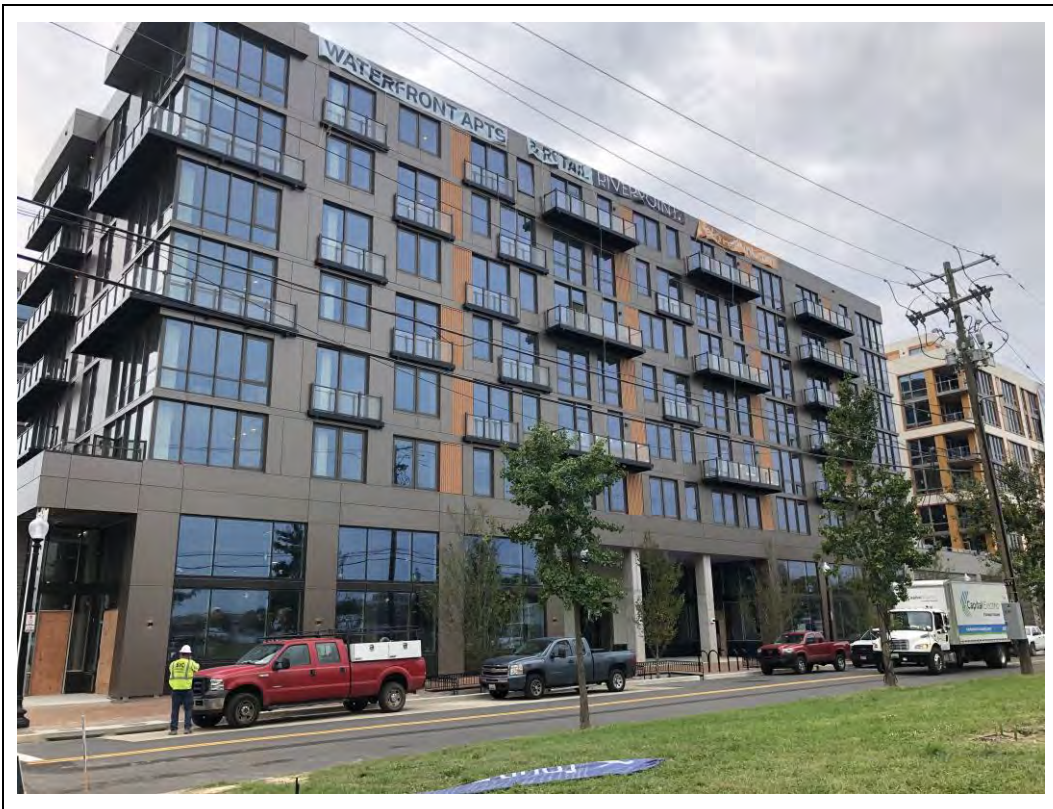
View looking towards the northern portion of the Site, from the north adjoining parking lot
